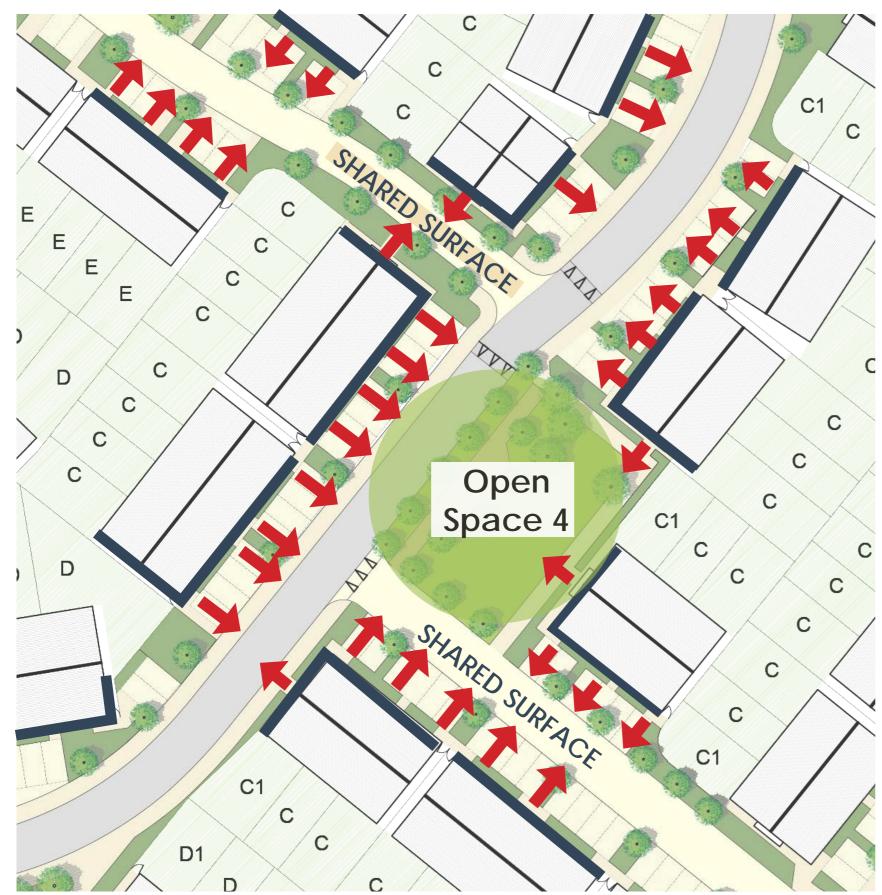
Detail plan of typical pocket park. Source: MCORM, 2022.
